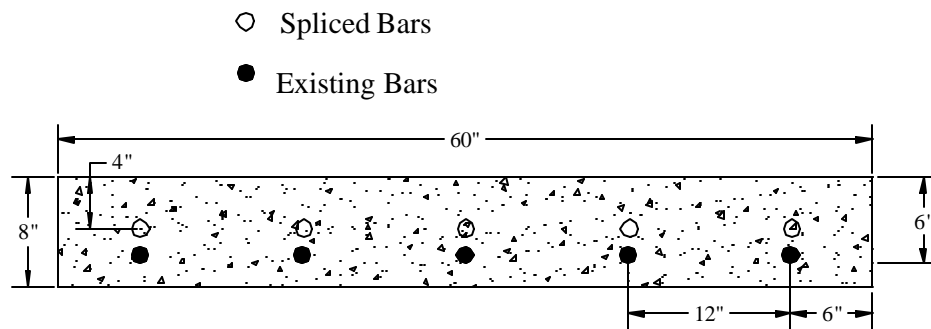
Test Series 1-3, Specimen C and D reinforcement spacing and depth
